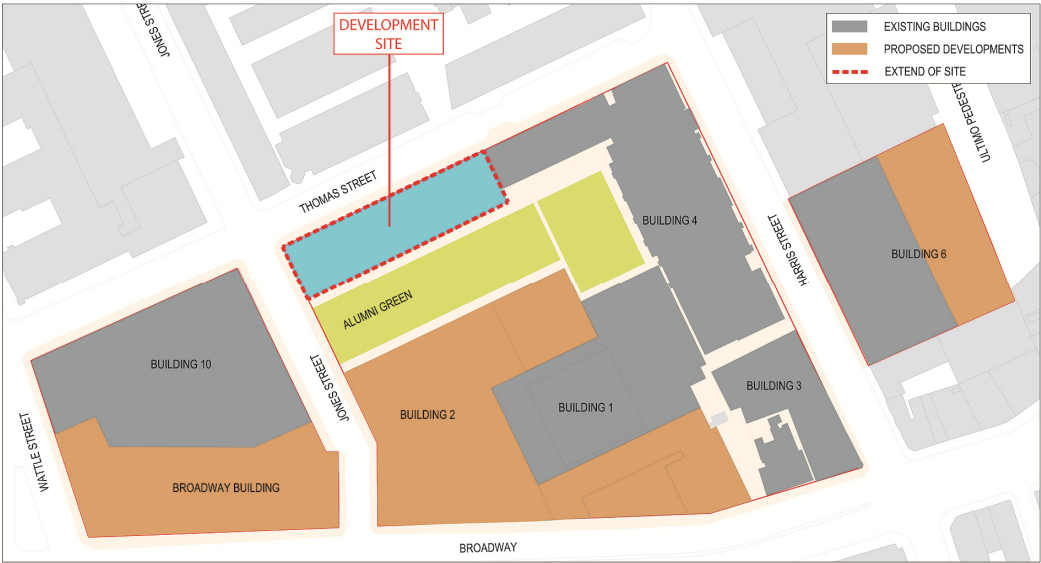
UTS Broadway Precinct and the Thomas Street Building site
